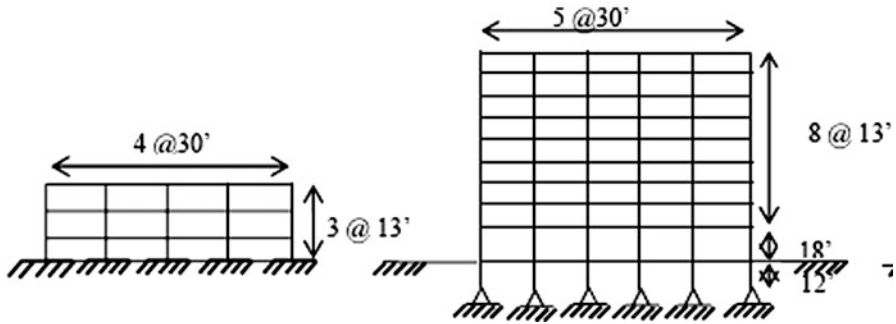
Elevation of SAC buildings: 3- and 9-story (from left to right)
